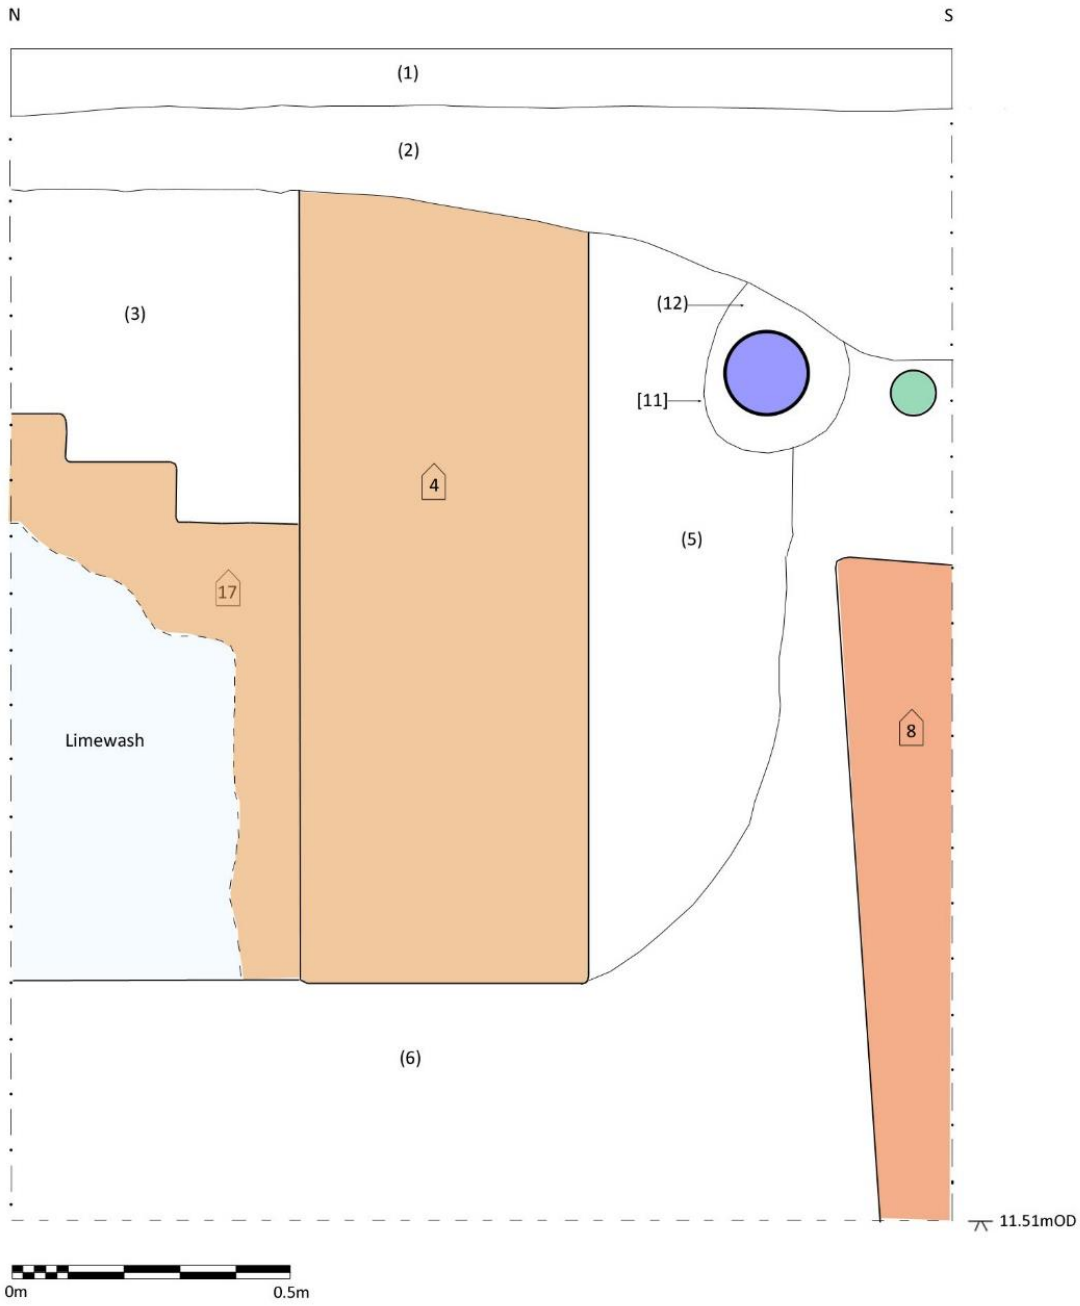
Drop Shaft 1. West facing section. Original drawn at 1:10.
